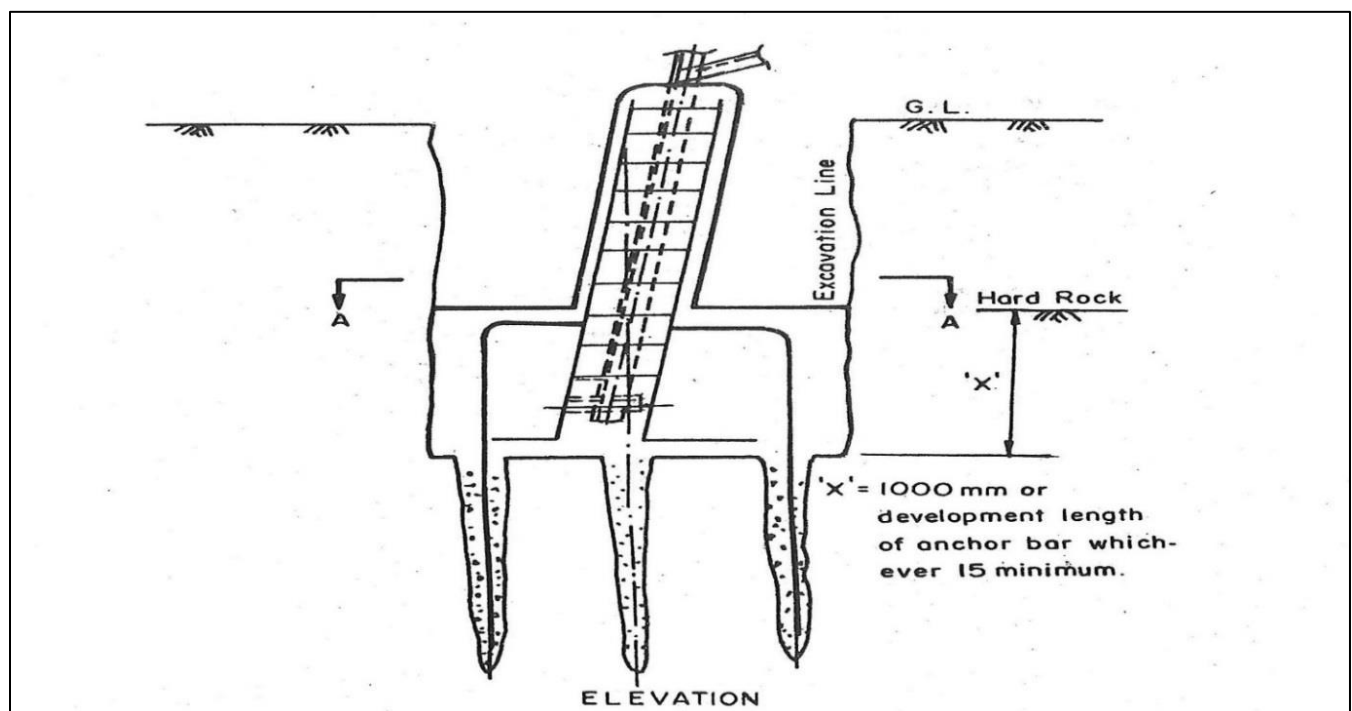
Grouted Rock/Anchor Type Foundation (Hard Rock Foundation)
